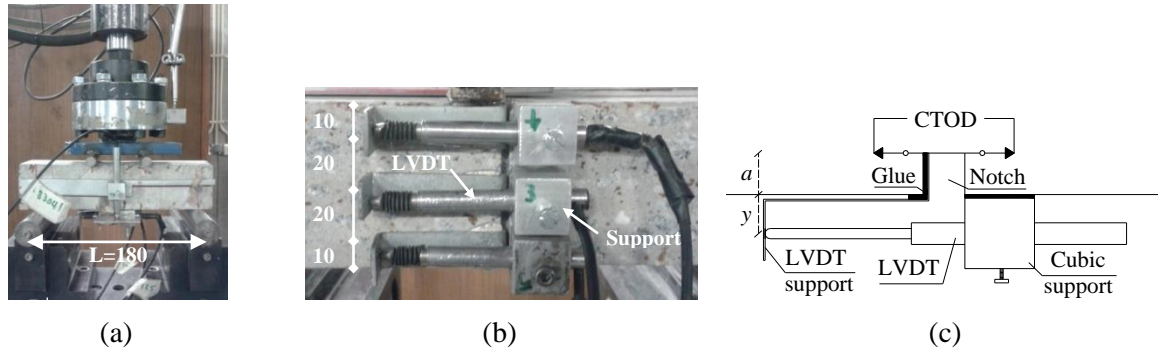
Test set-up of the monotonic four-point bending test (dimensions are in mm): (a) geometry of the specimen (b) LVDTs to determine CMOD, (c) LVDT connection details.
